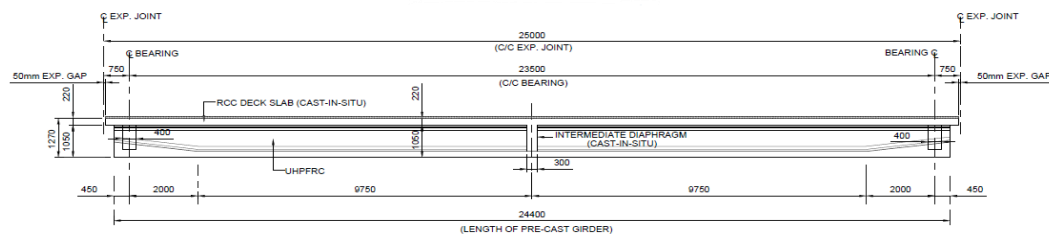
21 Elevation of 25m span UHPFRC post tensioned I girder
